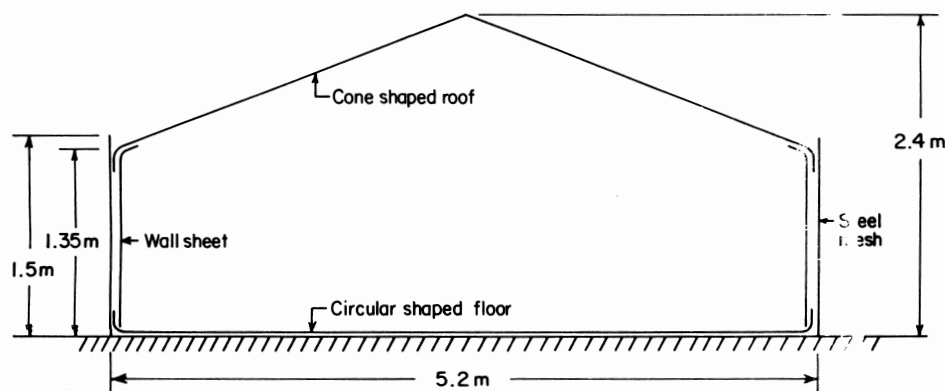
Vertical cross section along a diameter of an emergency bin with a steel mesh supporting wall.
